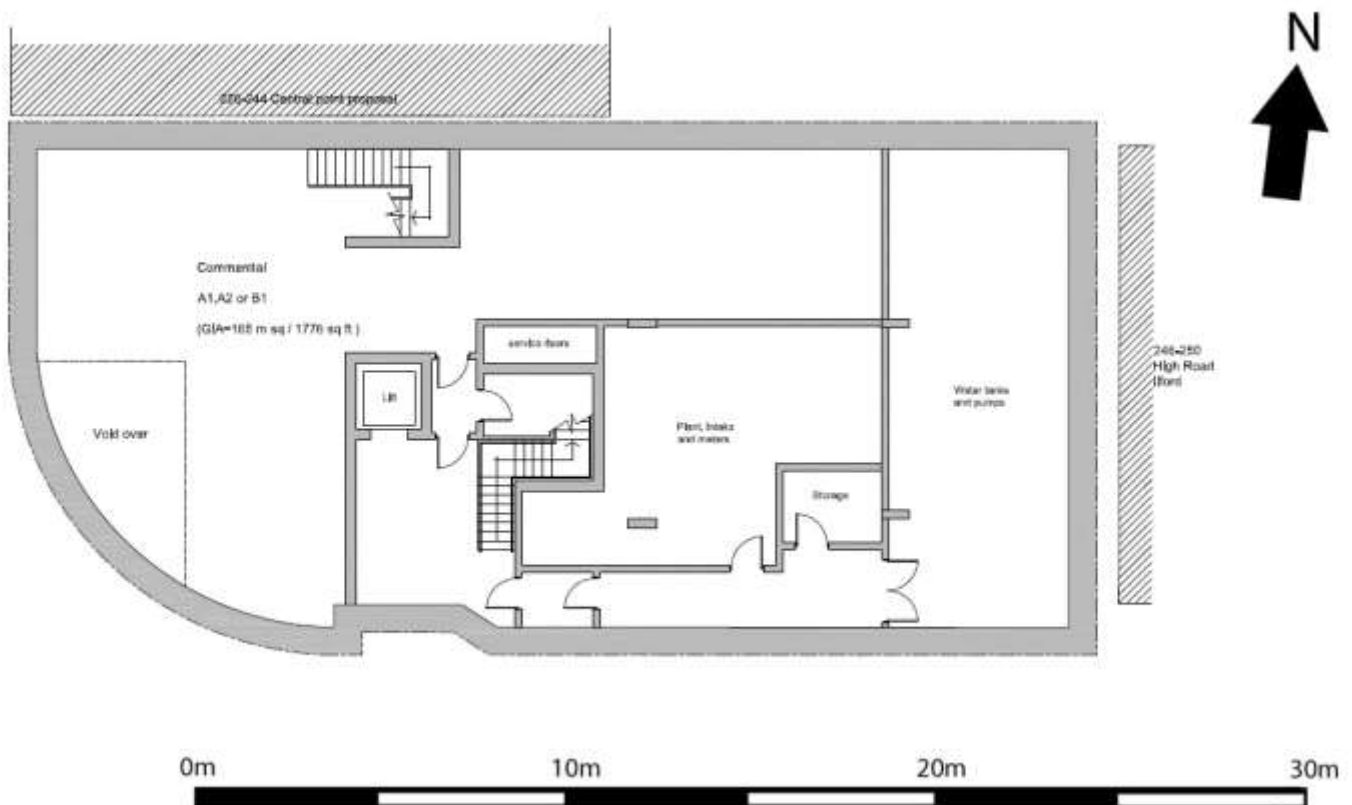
Plan of the proposed basement adapted from original drawings by ATP Group provided by Client
